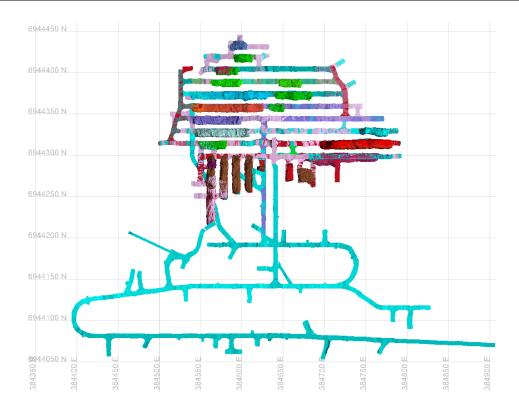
Area 118 Underground As-Built (Dec. 2015) Plan View
